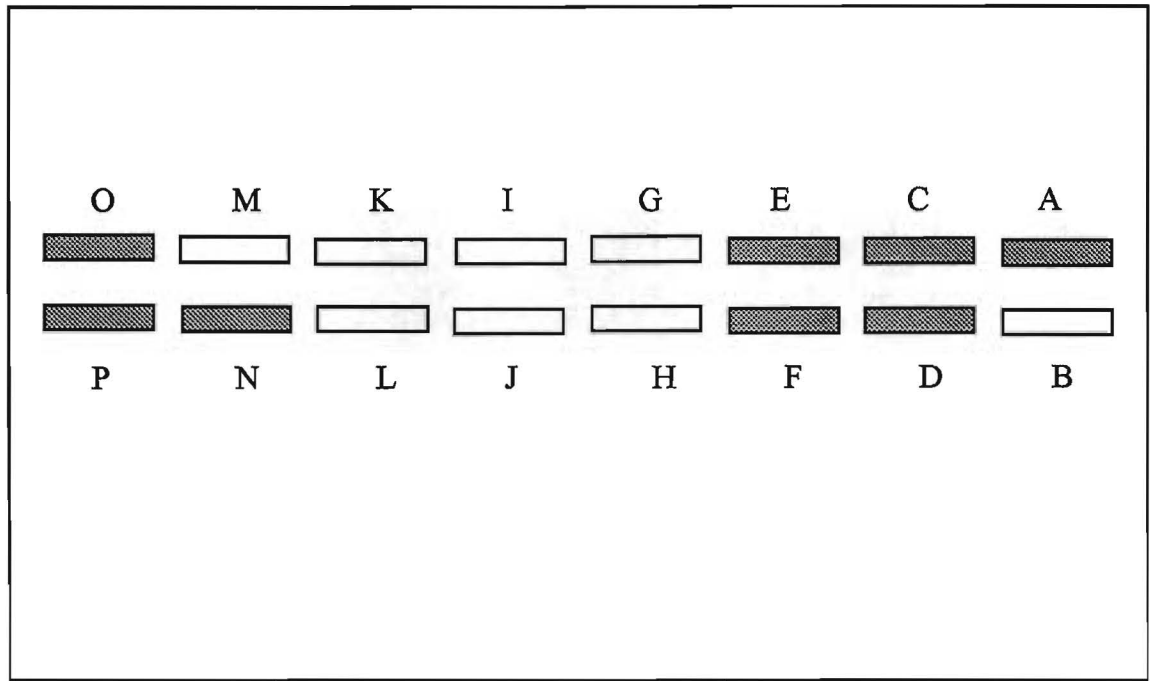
Layout of the concrete pavement slabs on the Texas A&M University campus.
